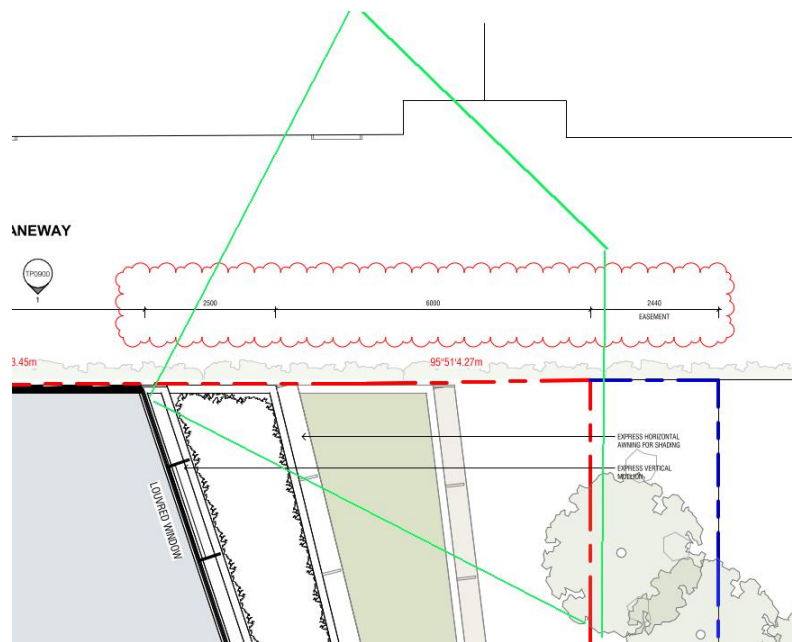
Mark-up of Level 3 showing potential overlooking to south-facing window at No. 7 Sanders Place
